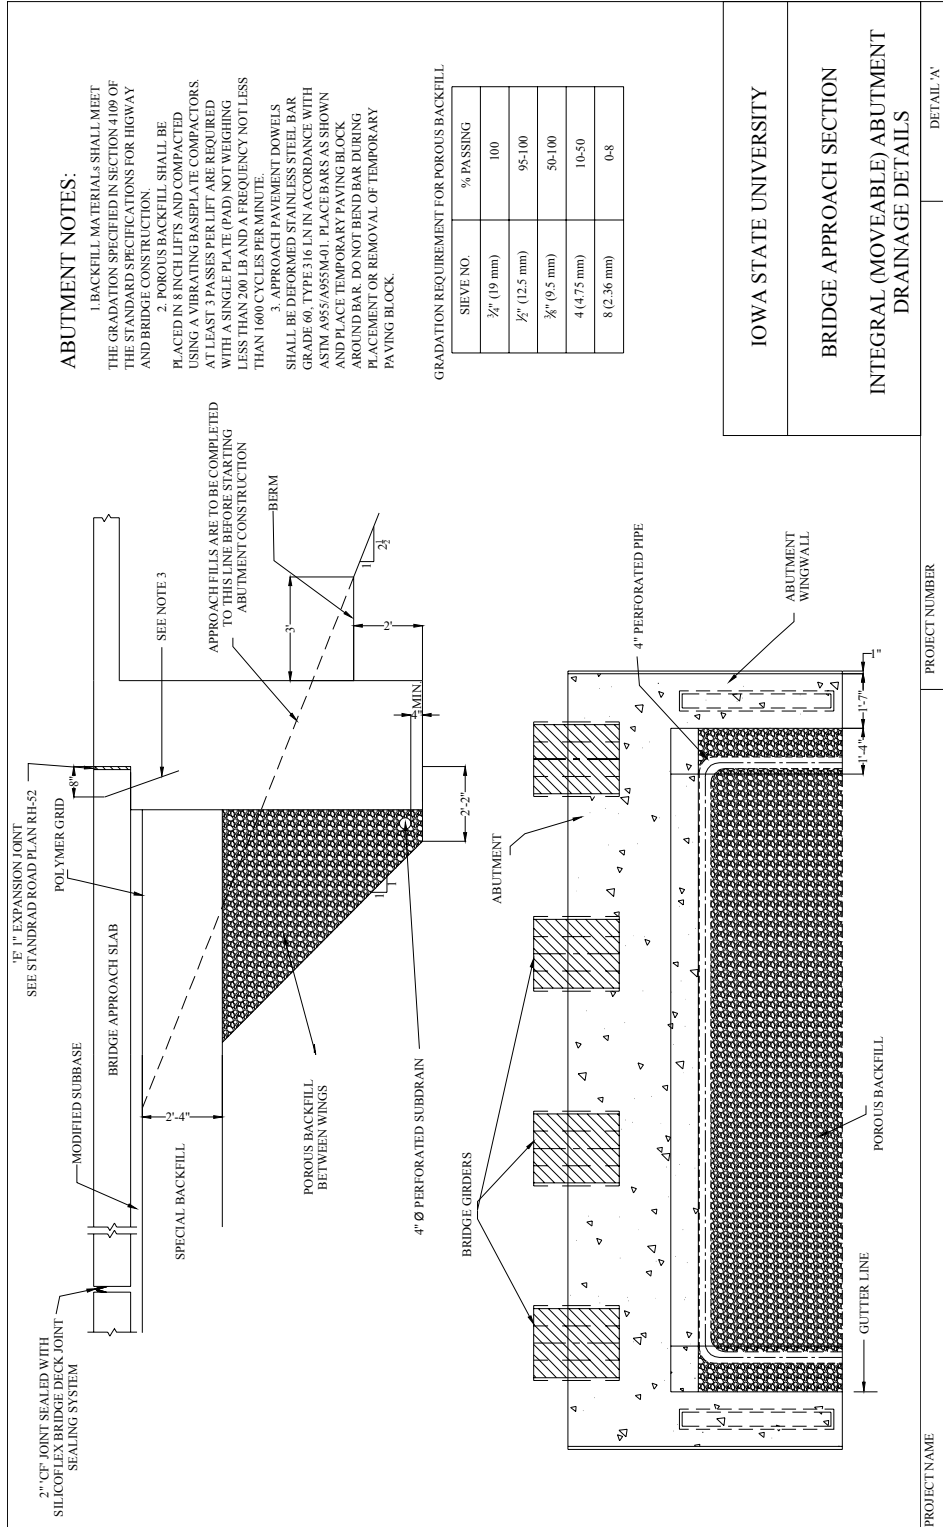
Proposed integral bridge approach drainage detail with porous backfill
